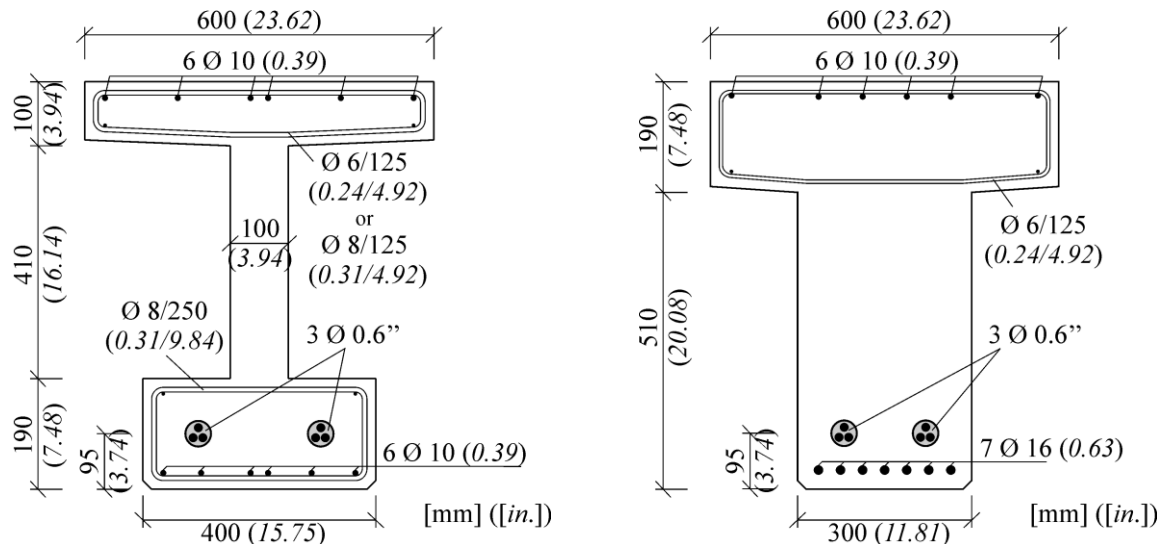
Cross-sections of the I-beams (left) and T-beams (right)
